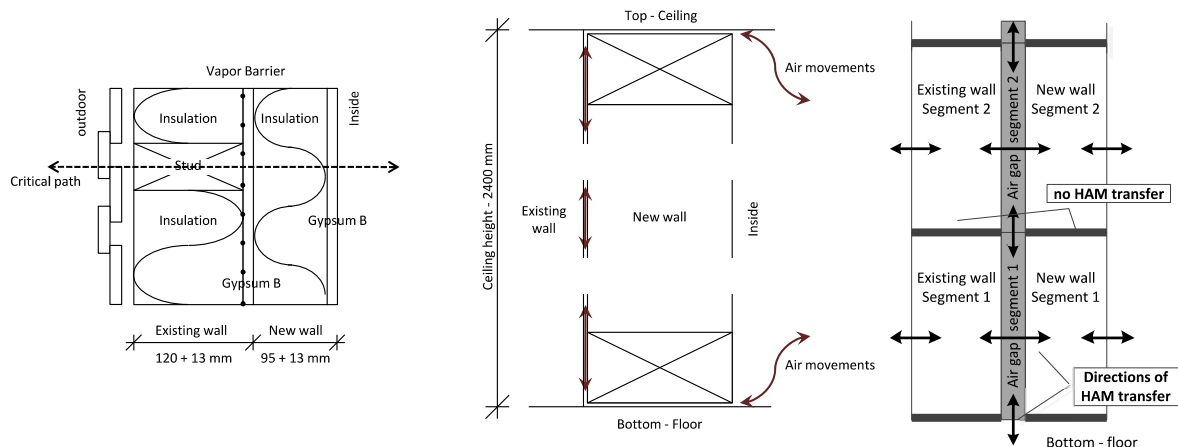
The left-hand plan drawing illustrates the assumed critical path of the retrofitted wall. The middle picture illustrates a section drawing of the simulated wall, in which the two-headed arrows demonstrate possible positions and directions of air intrusion. The right-hand scheme illustrates numerical coupling between the wall elements and the air gaps.
